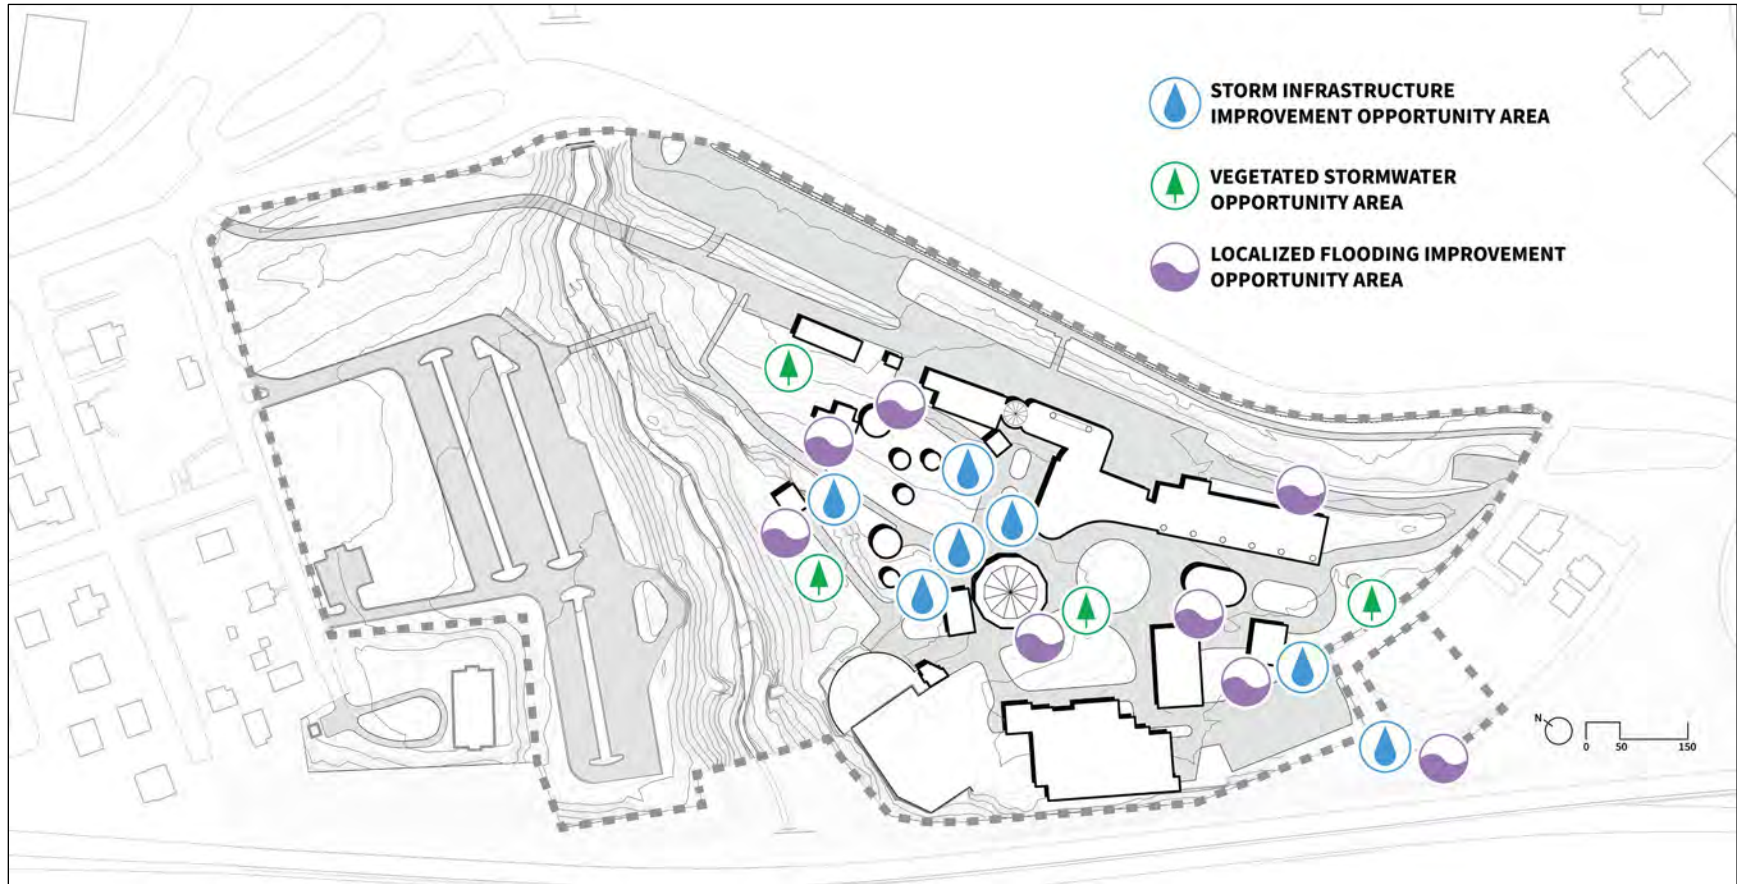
Alternative B – Proposed Stormwater Management Improvements
